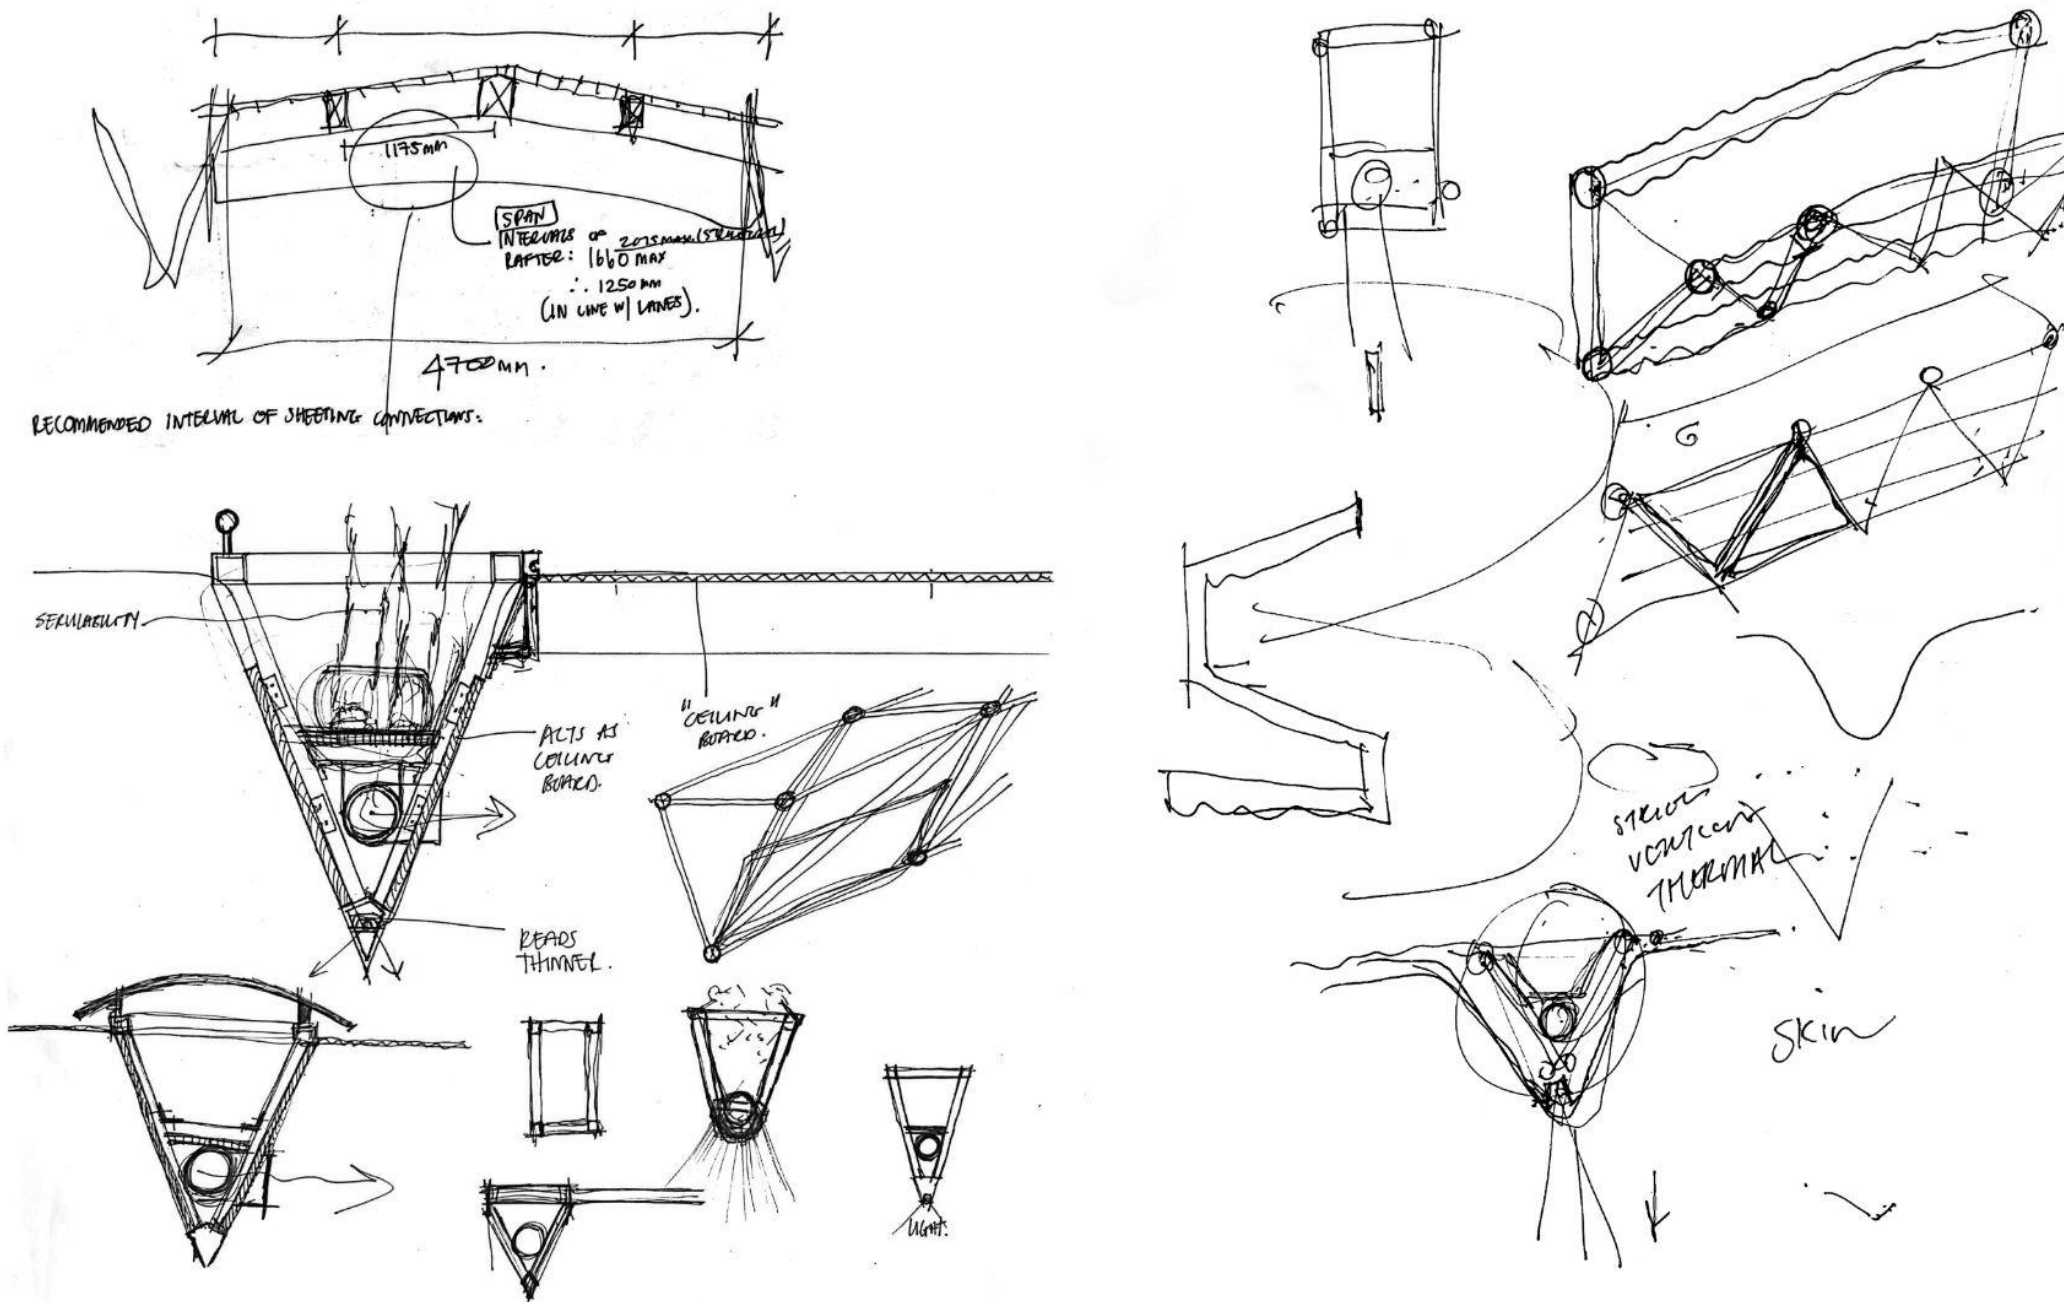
Iteration of the roof structure to determine how the roof and landscape will merge (Author, 2021)
